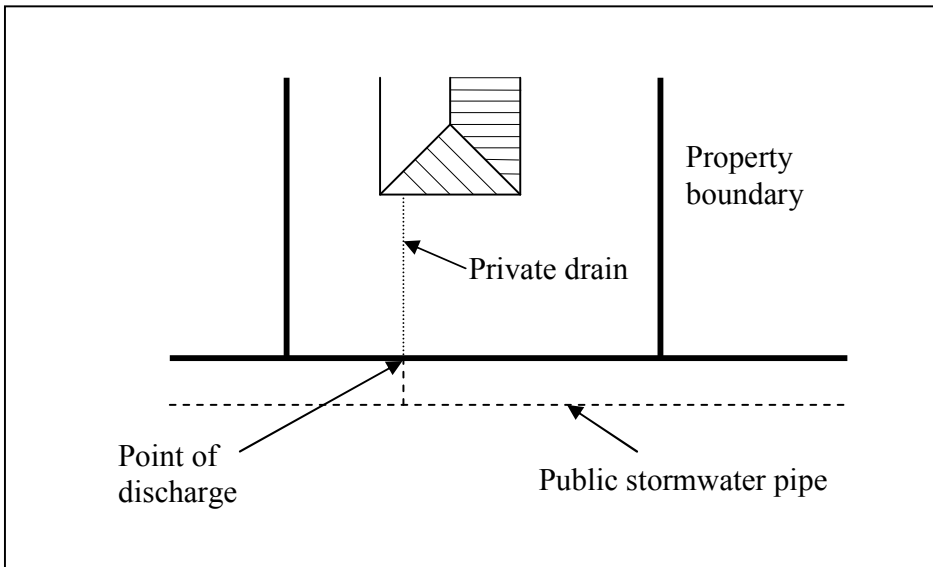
POINT OF DISCHARGE LOCATION - WITH STREET FRONTAGE
